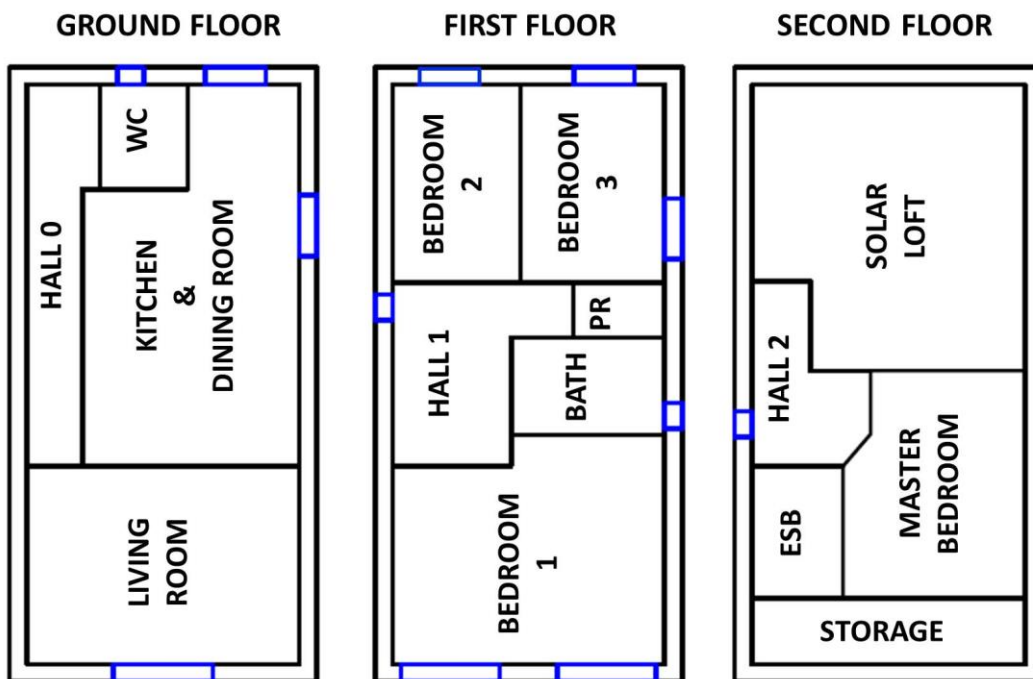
“Zero Bills Home” AX4 simplified floor plants
